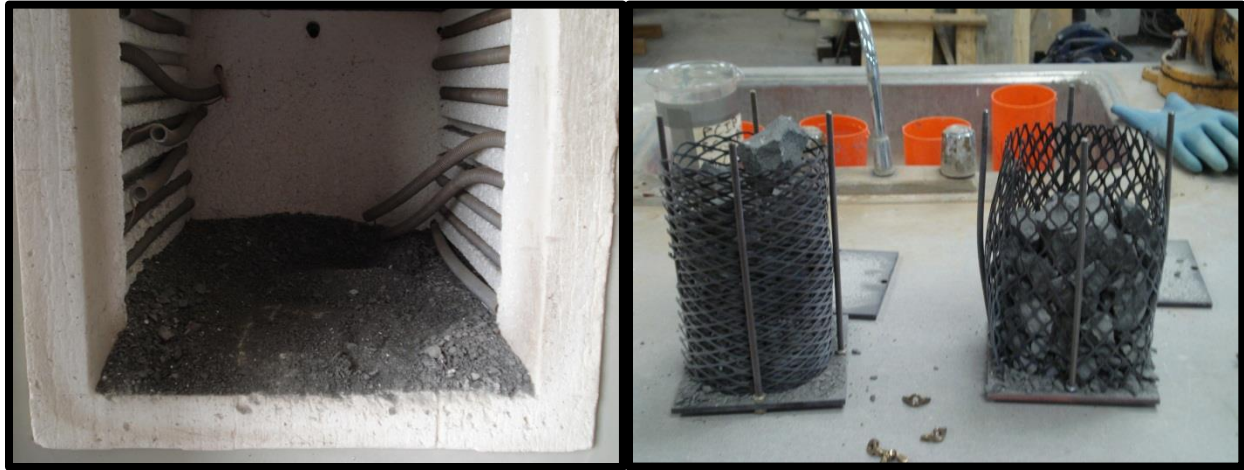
Testing Oven Damaged by Exploding Cylinder (Left) and Exploded Cylinders in Steel Cages (Right)
